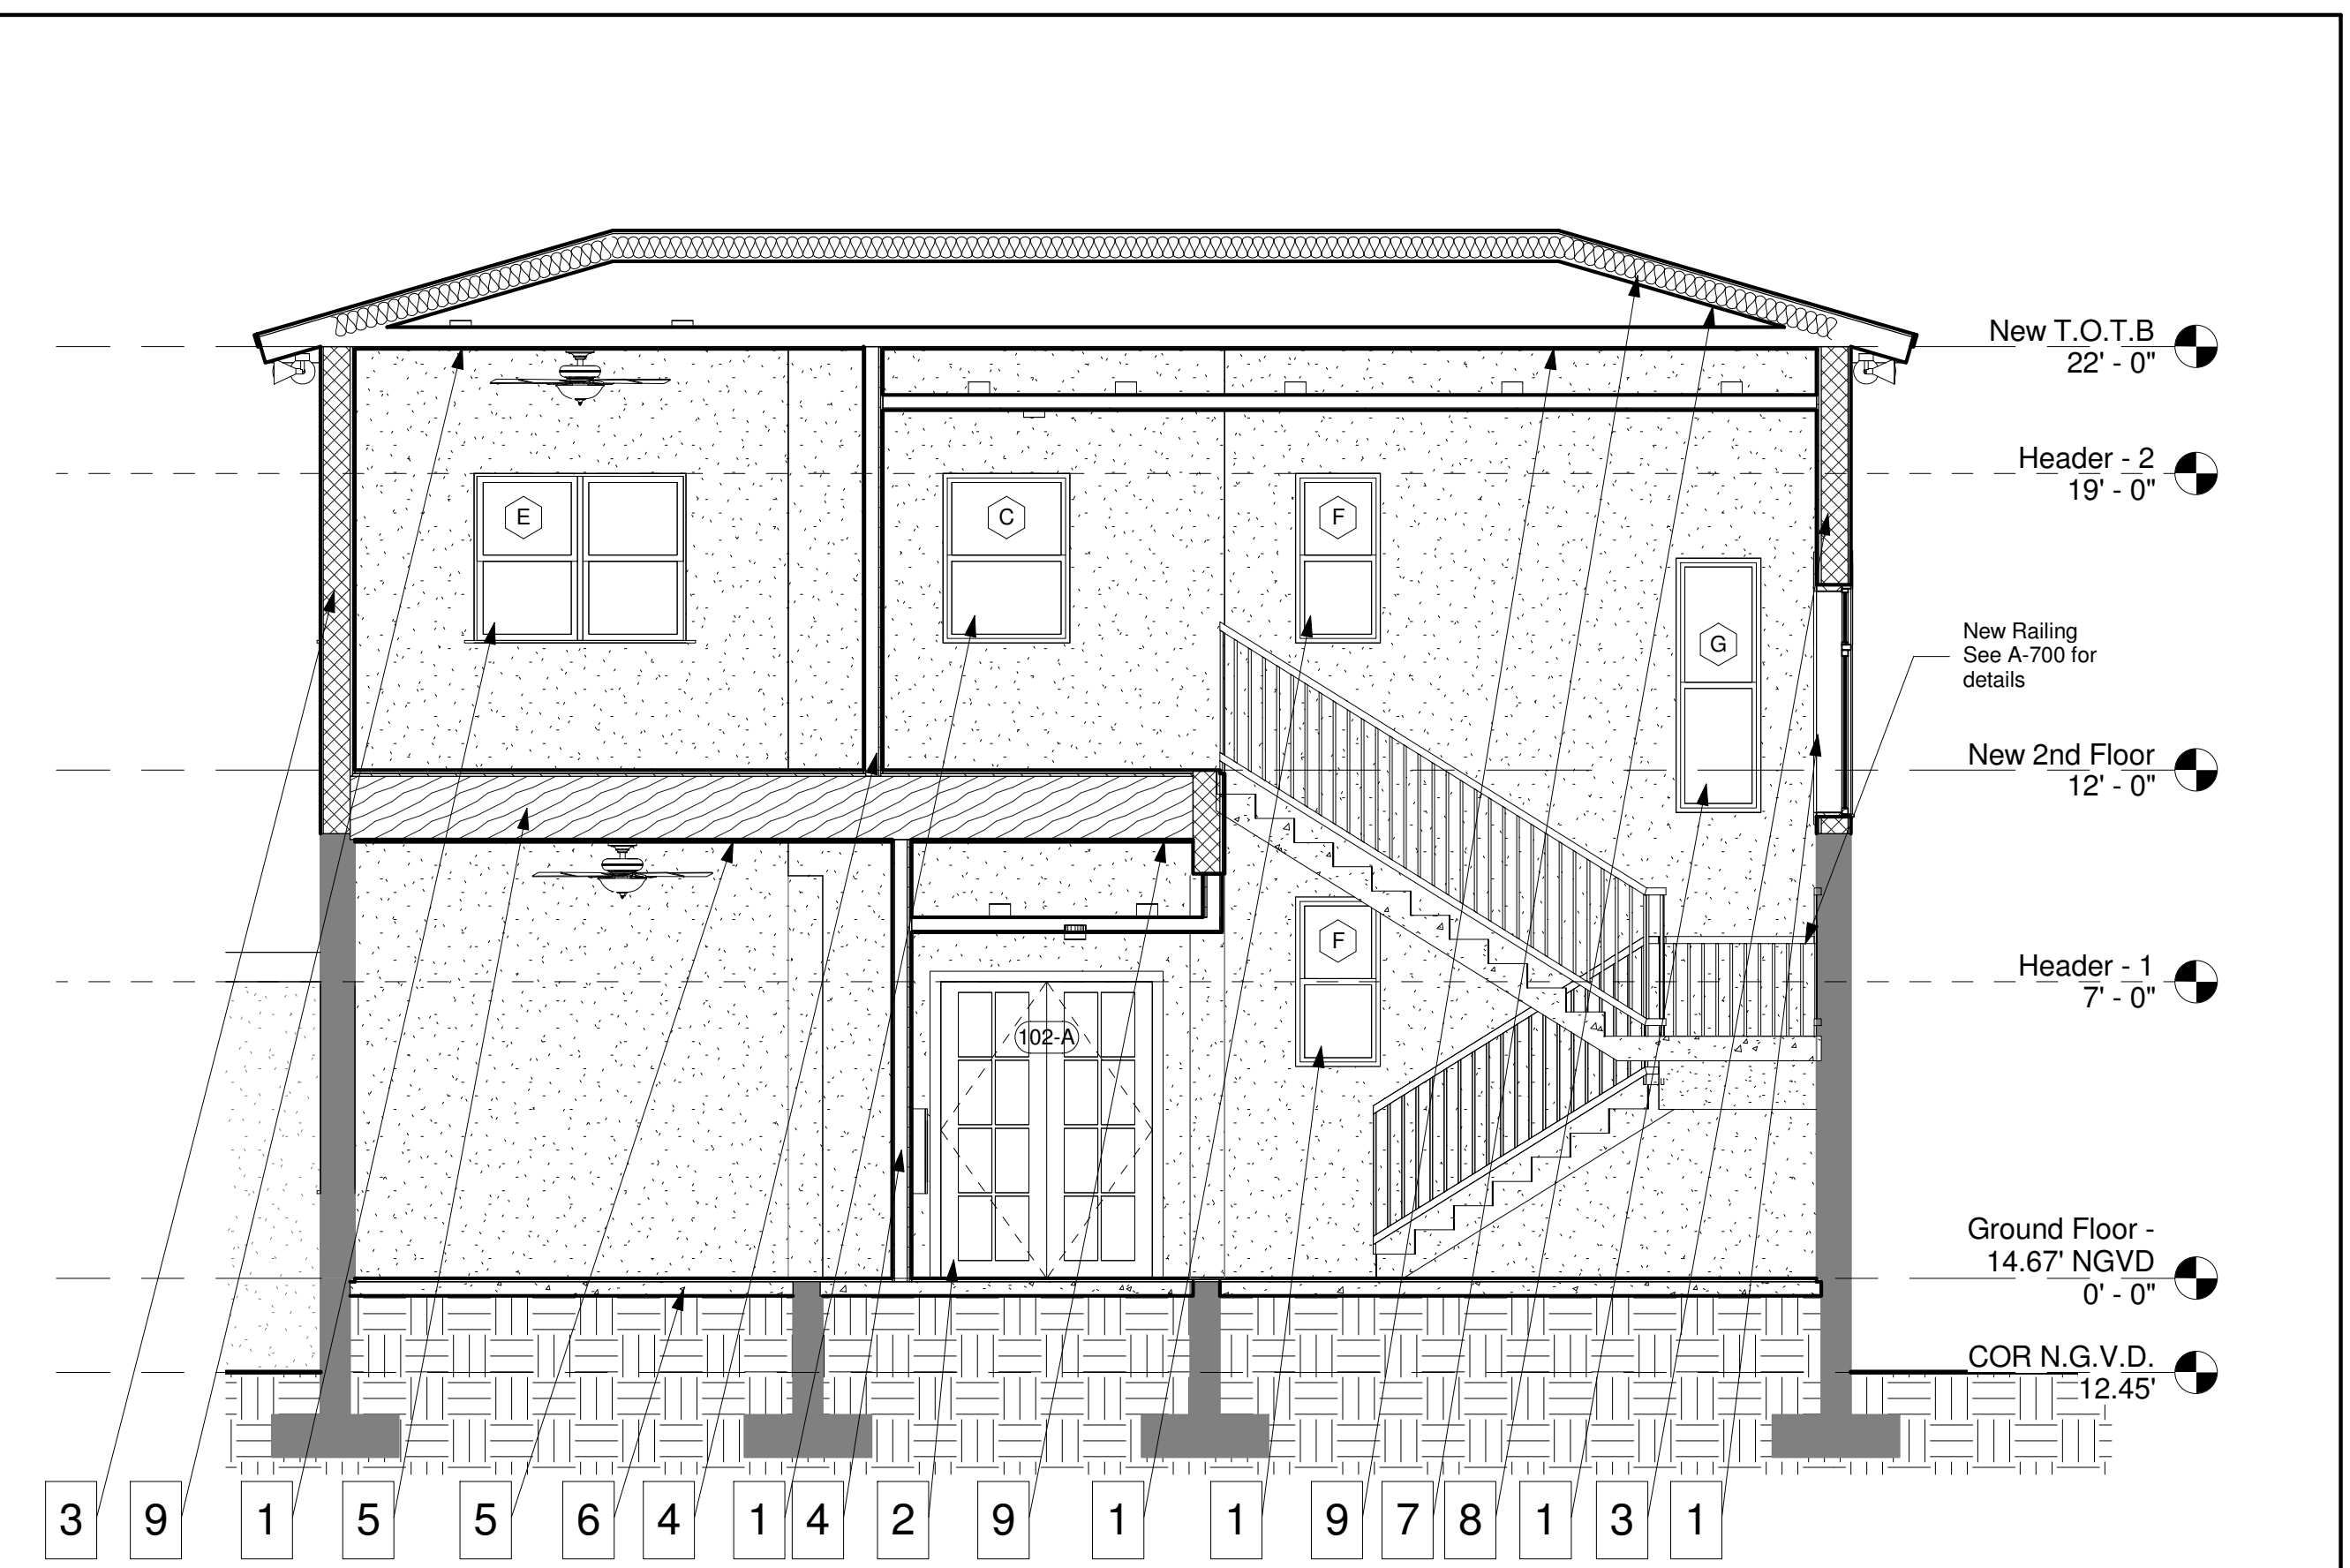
Scale: 1/4" = 1'-0" Section 4
